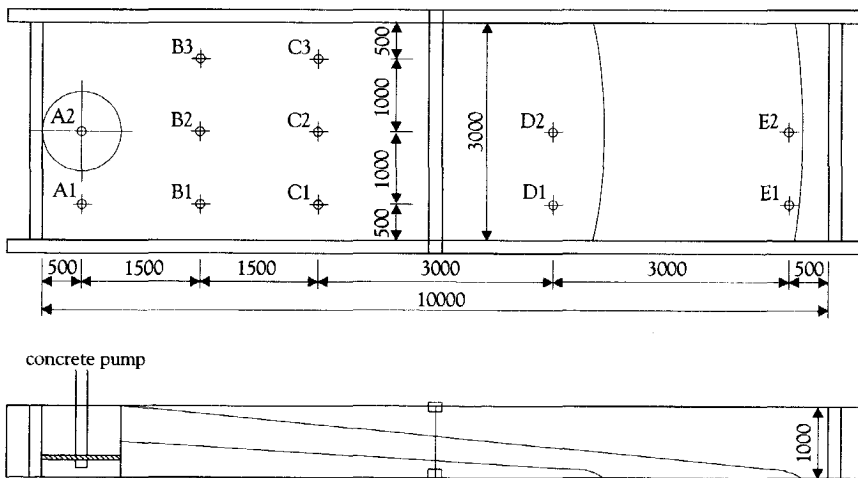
Testing basin (dimensions in mm) for placement of steel fibre reinforced underwater concrete slab (Source: Boortunnelcombinatie BTC)
